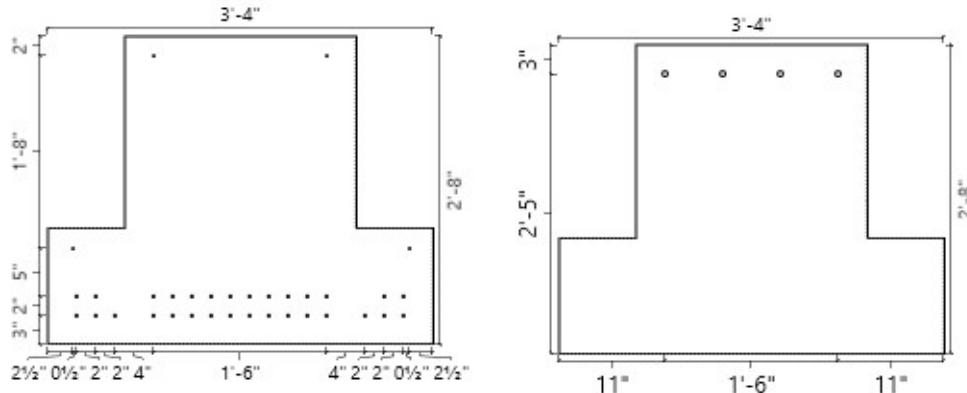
Reinforcement Locations of Strand (Left) and Rebar (Right)
